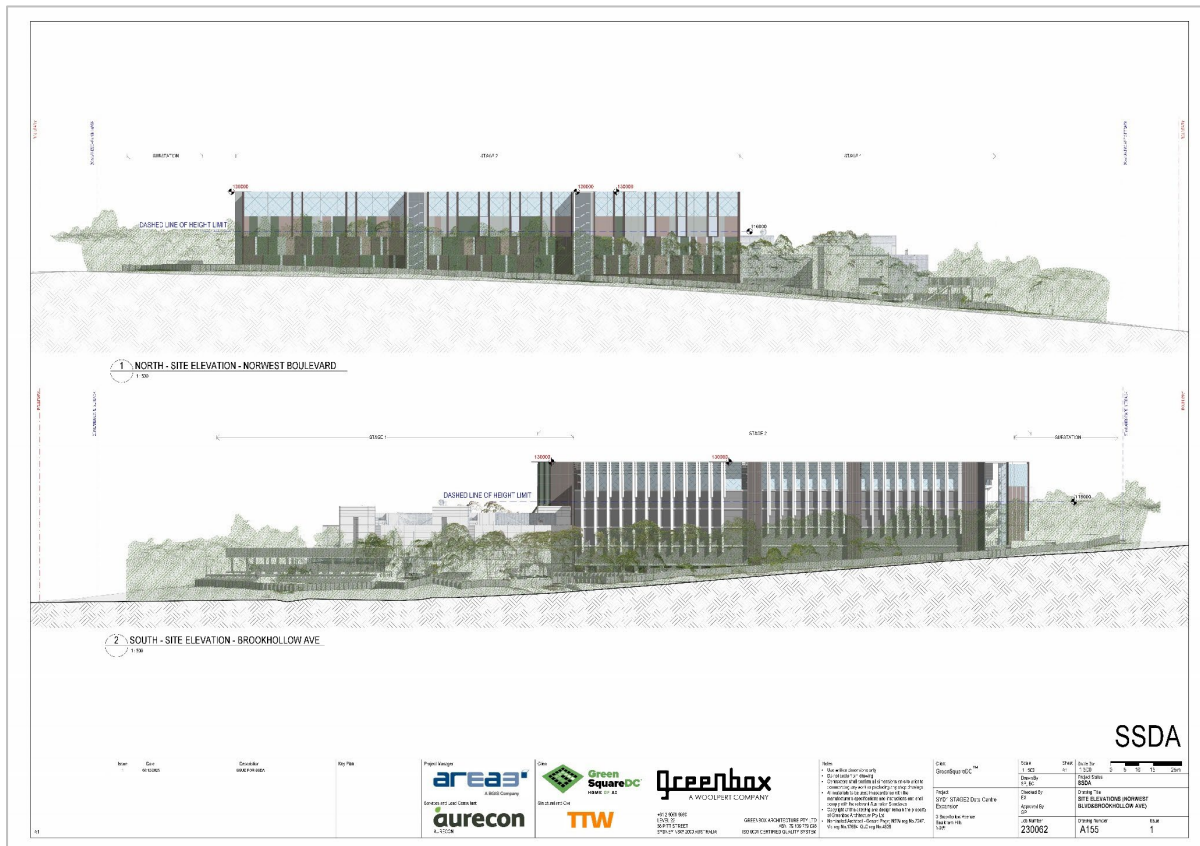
Site Elevations (Source: Greenbox. 2025).
